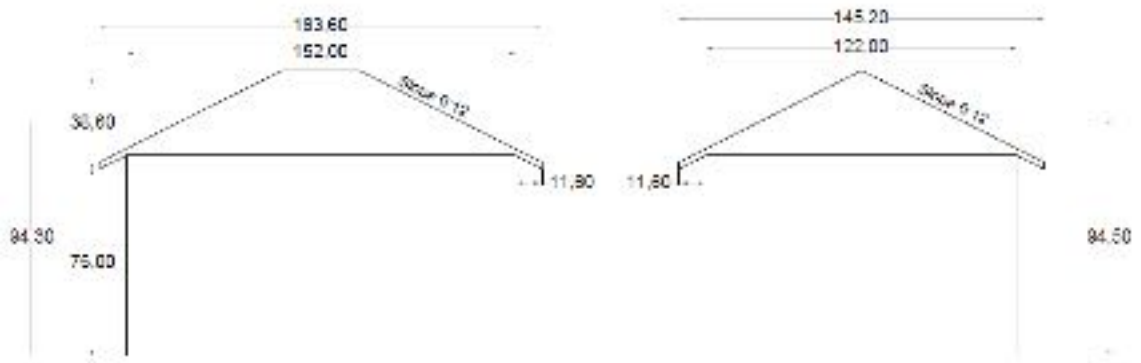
9: Model H layout (a) Elevation View (b) Side View (all dimensions are at model-scale in cm)
